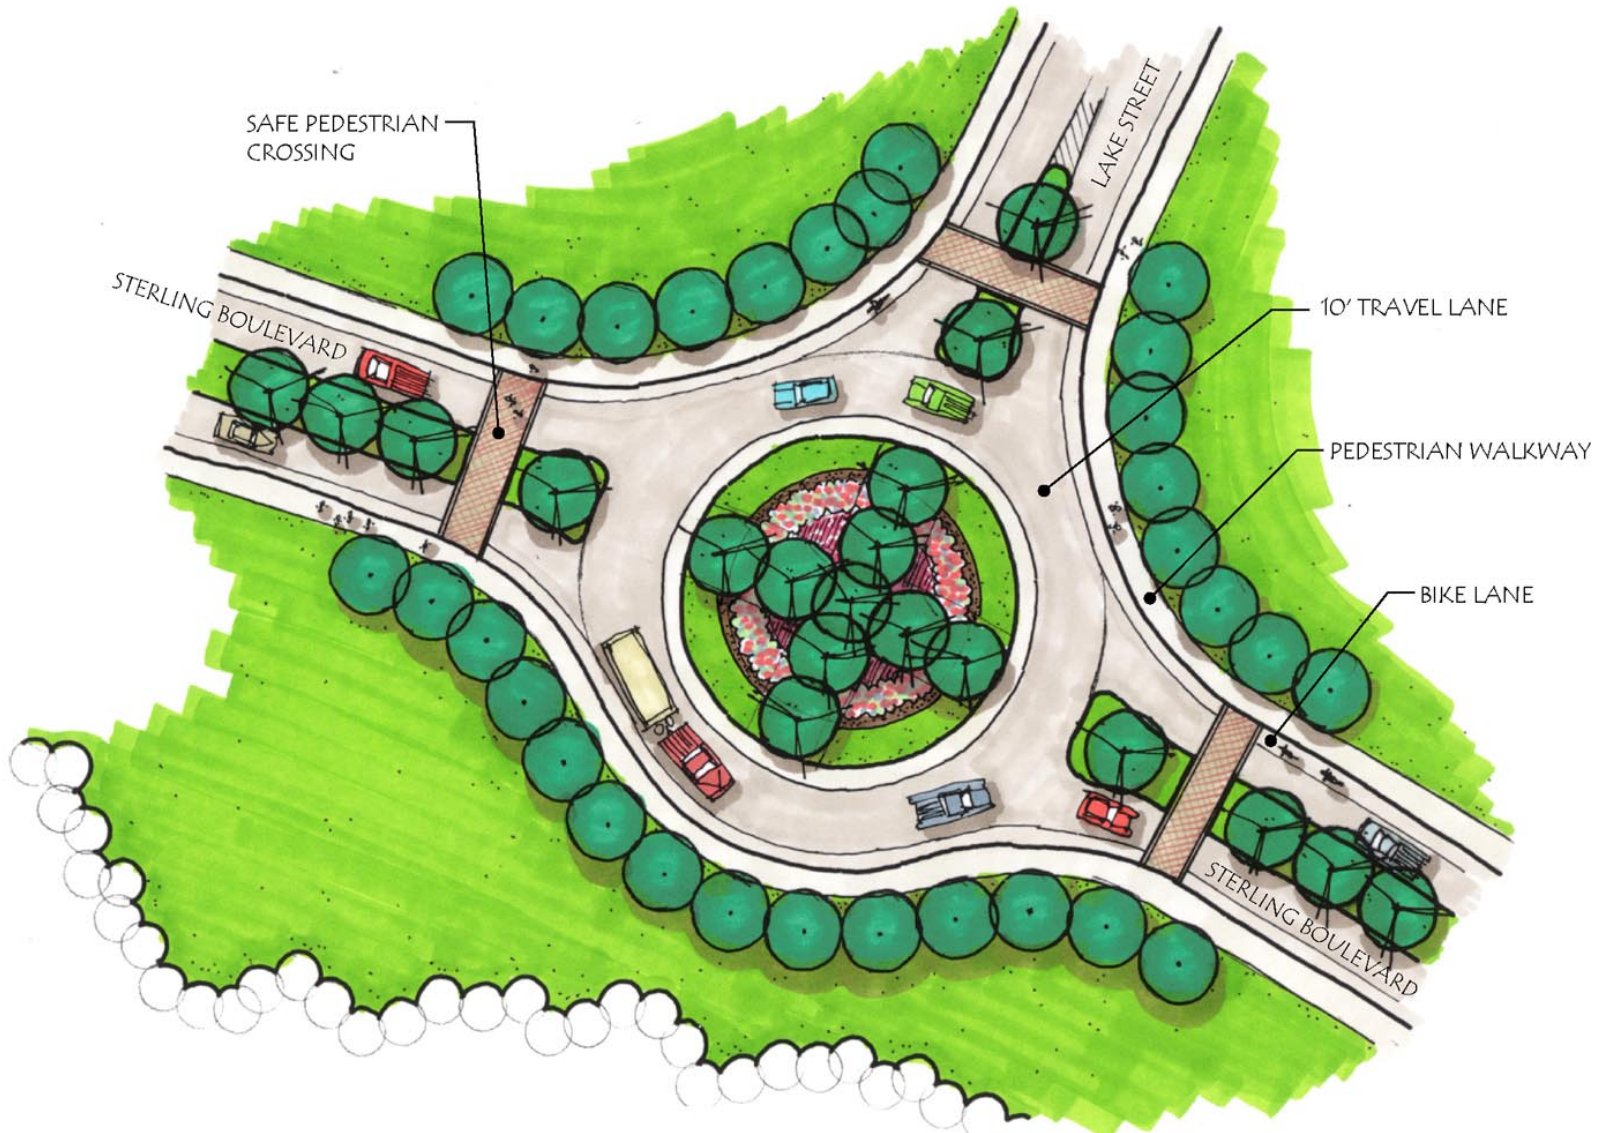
Roundabout at Intersection of Sterling Boulevard and Lake Street
